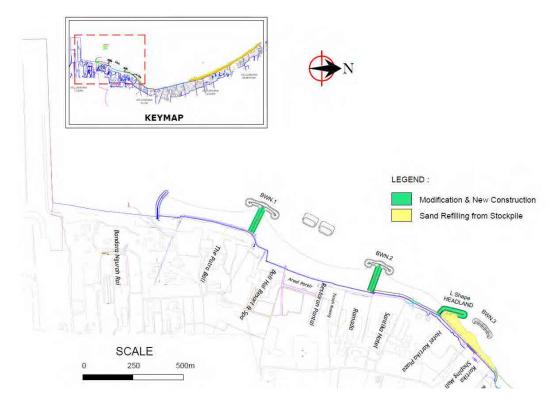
Layout Plan for the Improvement at Kuta (Reposted from Chapter 11) (Source: JICA Study Team)
